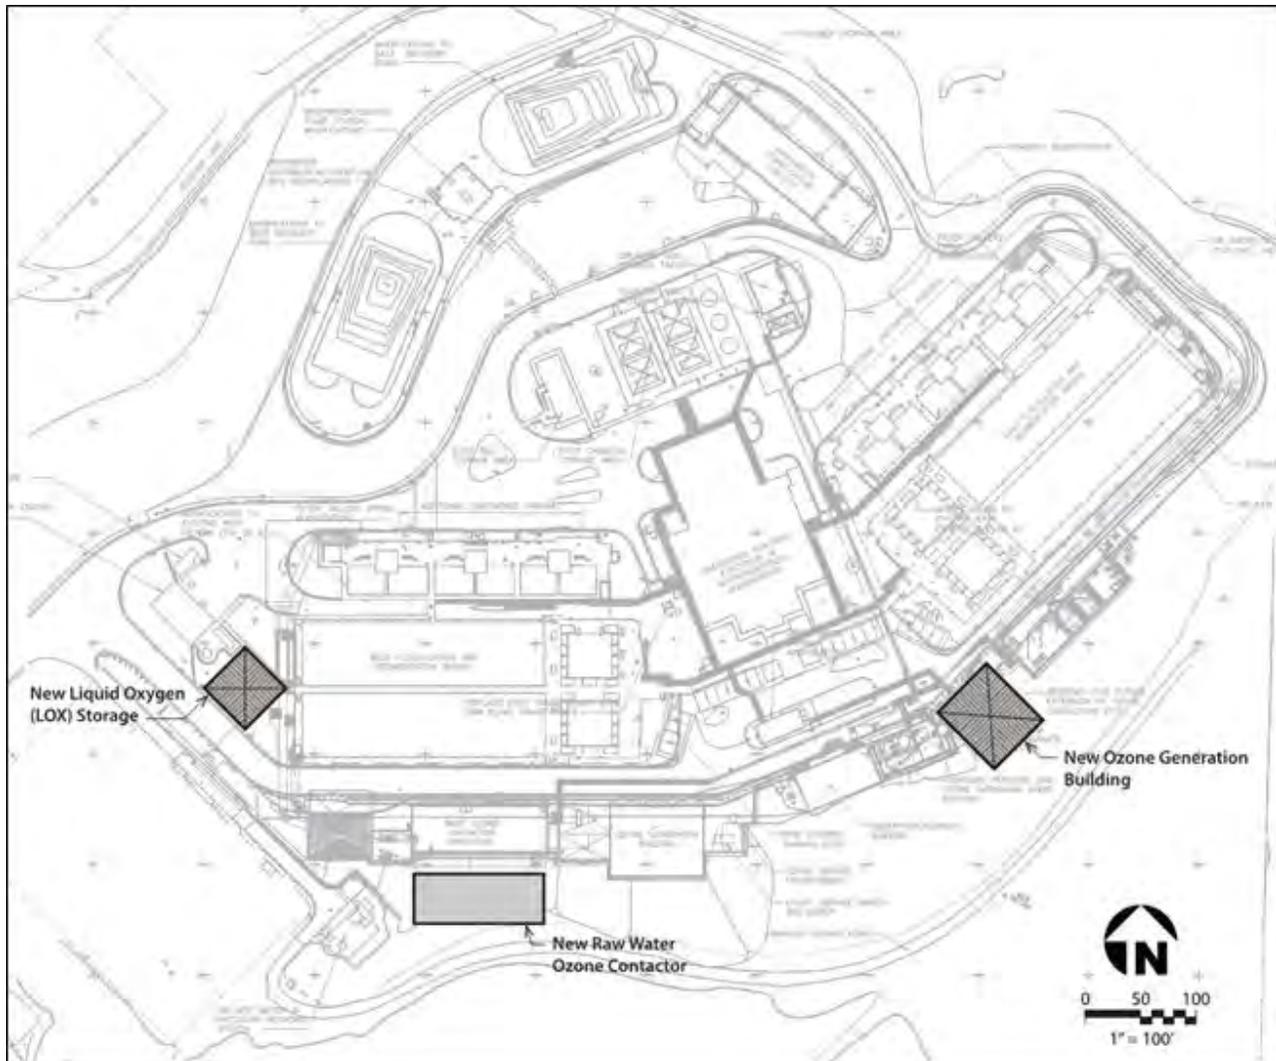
Santa Teresa WTP Conceptual Site Plan – Raw Water Ozonation
